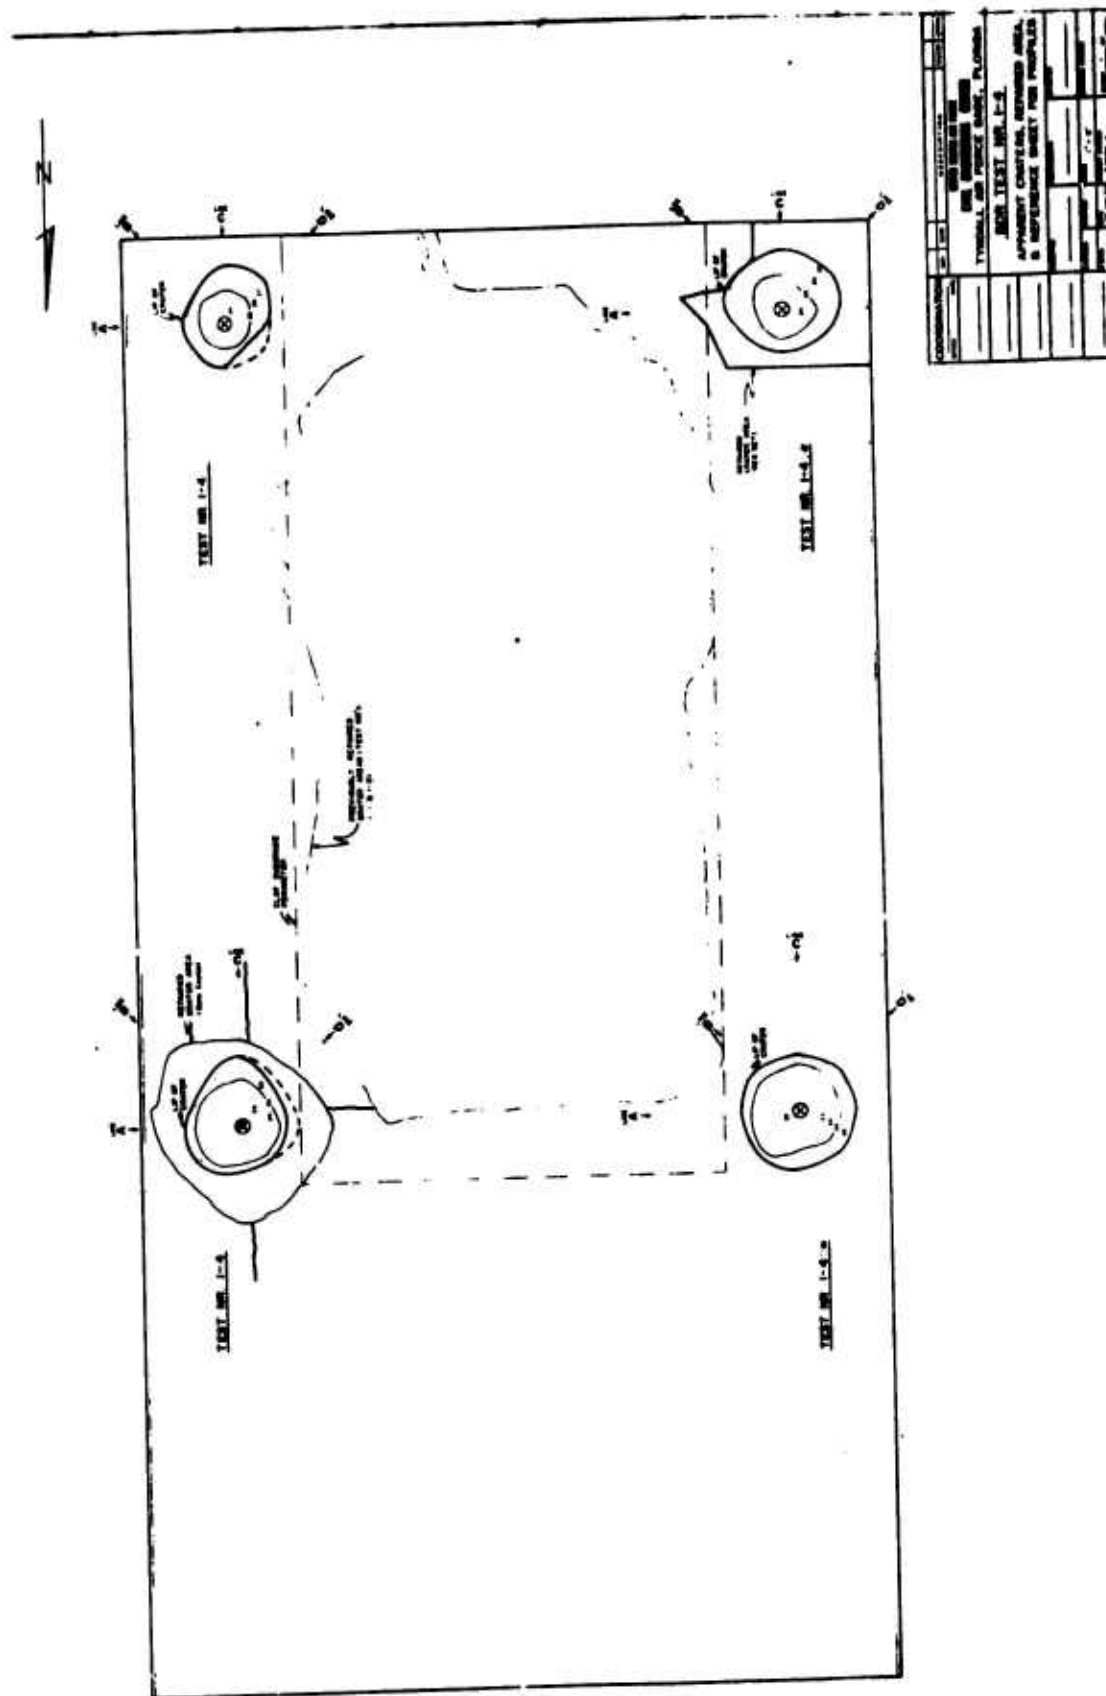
Plan View, Repaired Crater Perimeters, Crater Contours and Repair Locations, Test 1-4
